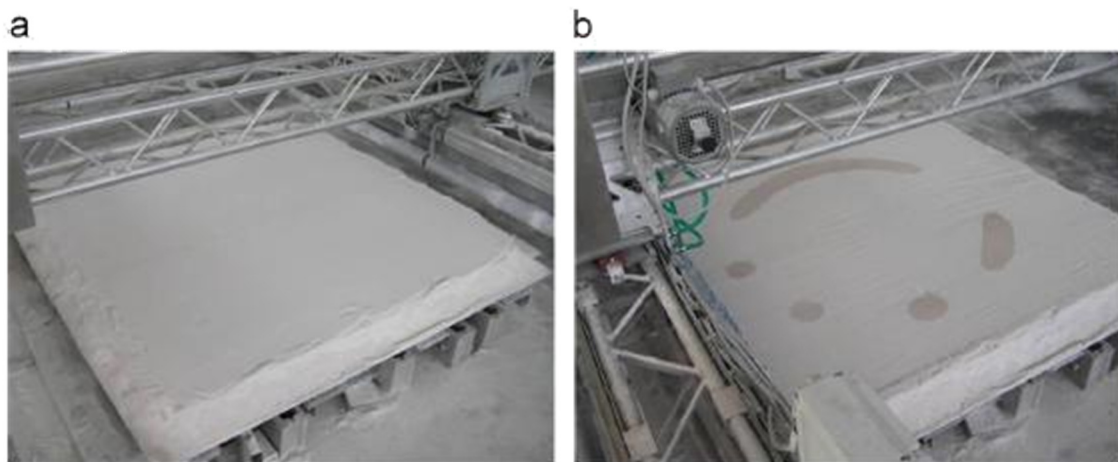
Printing process of the D-shape printer. (a) Sand layer prepared for binder deposition. (b) A sand layer with the binder deposited according to software directions [48].
